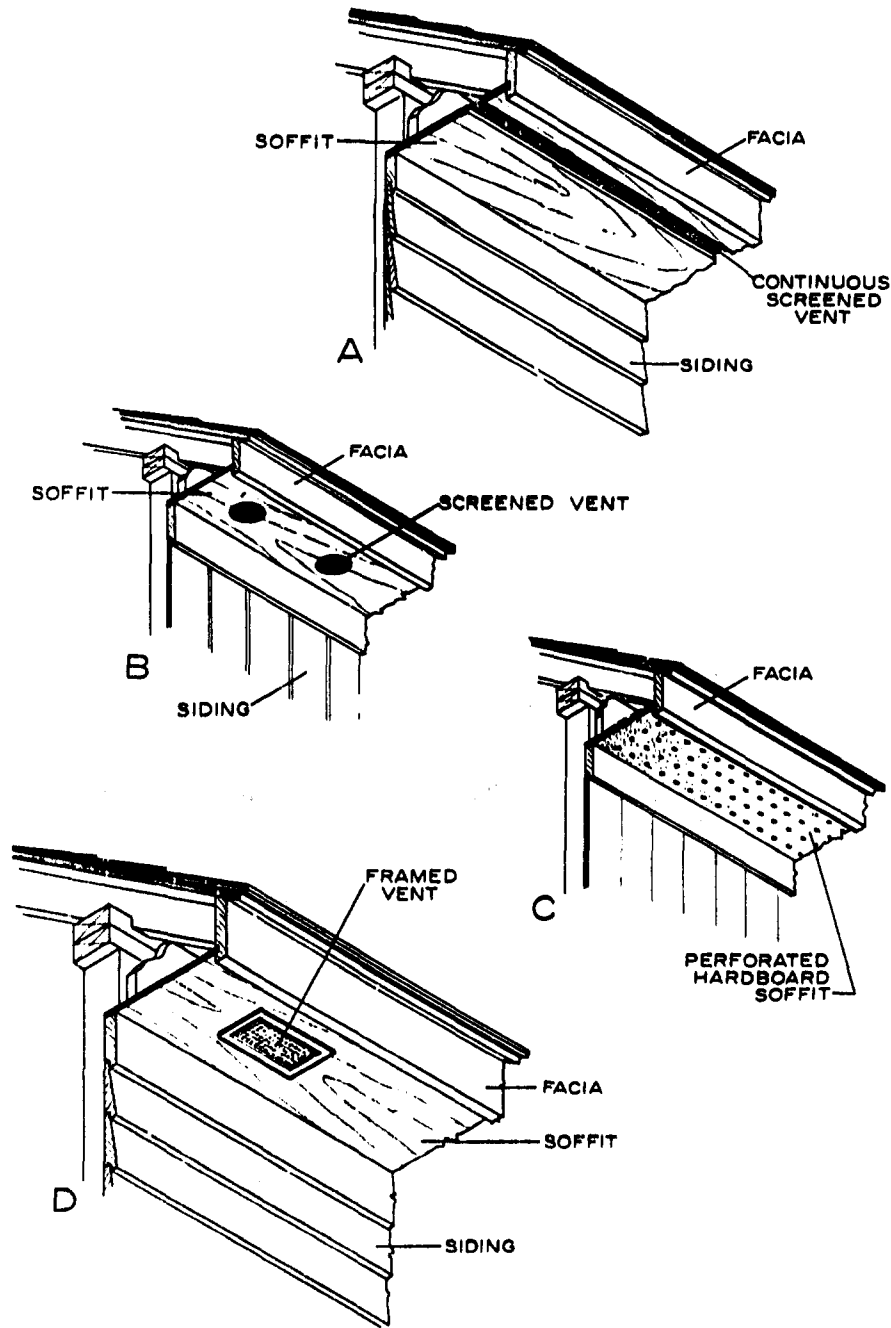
Inlet ventilators in soffits: A, Continuous vent; B, round vents; C, perforated; D, single ventilator. M 139 214
